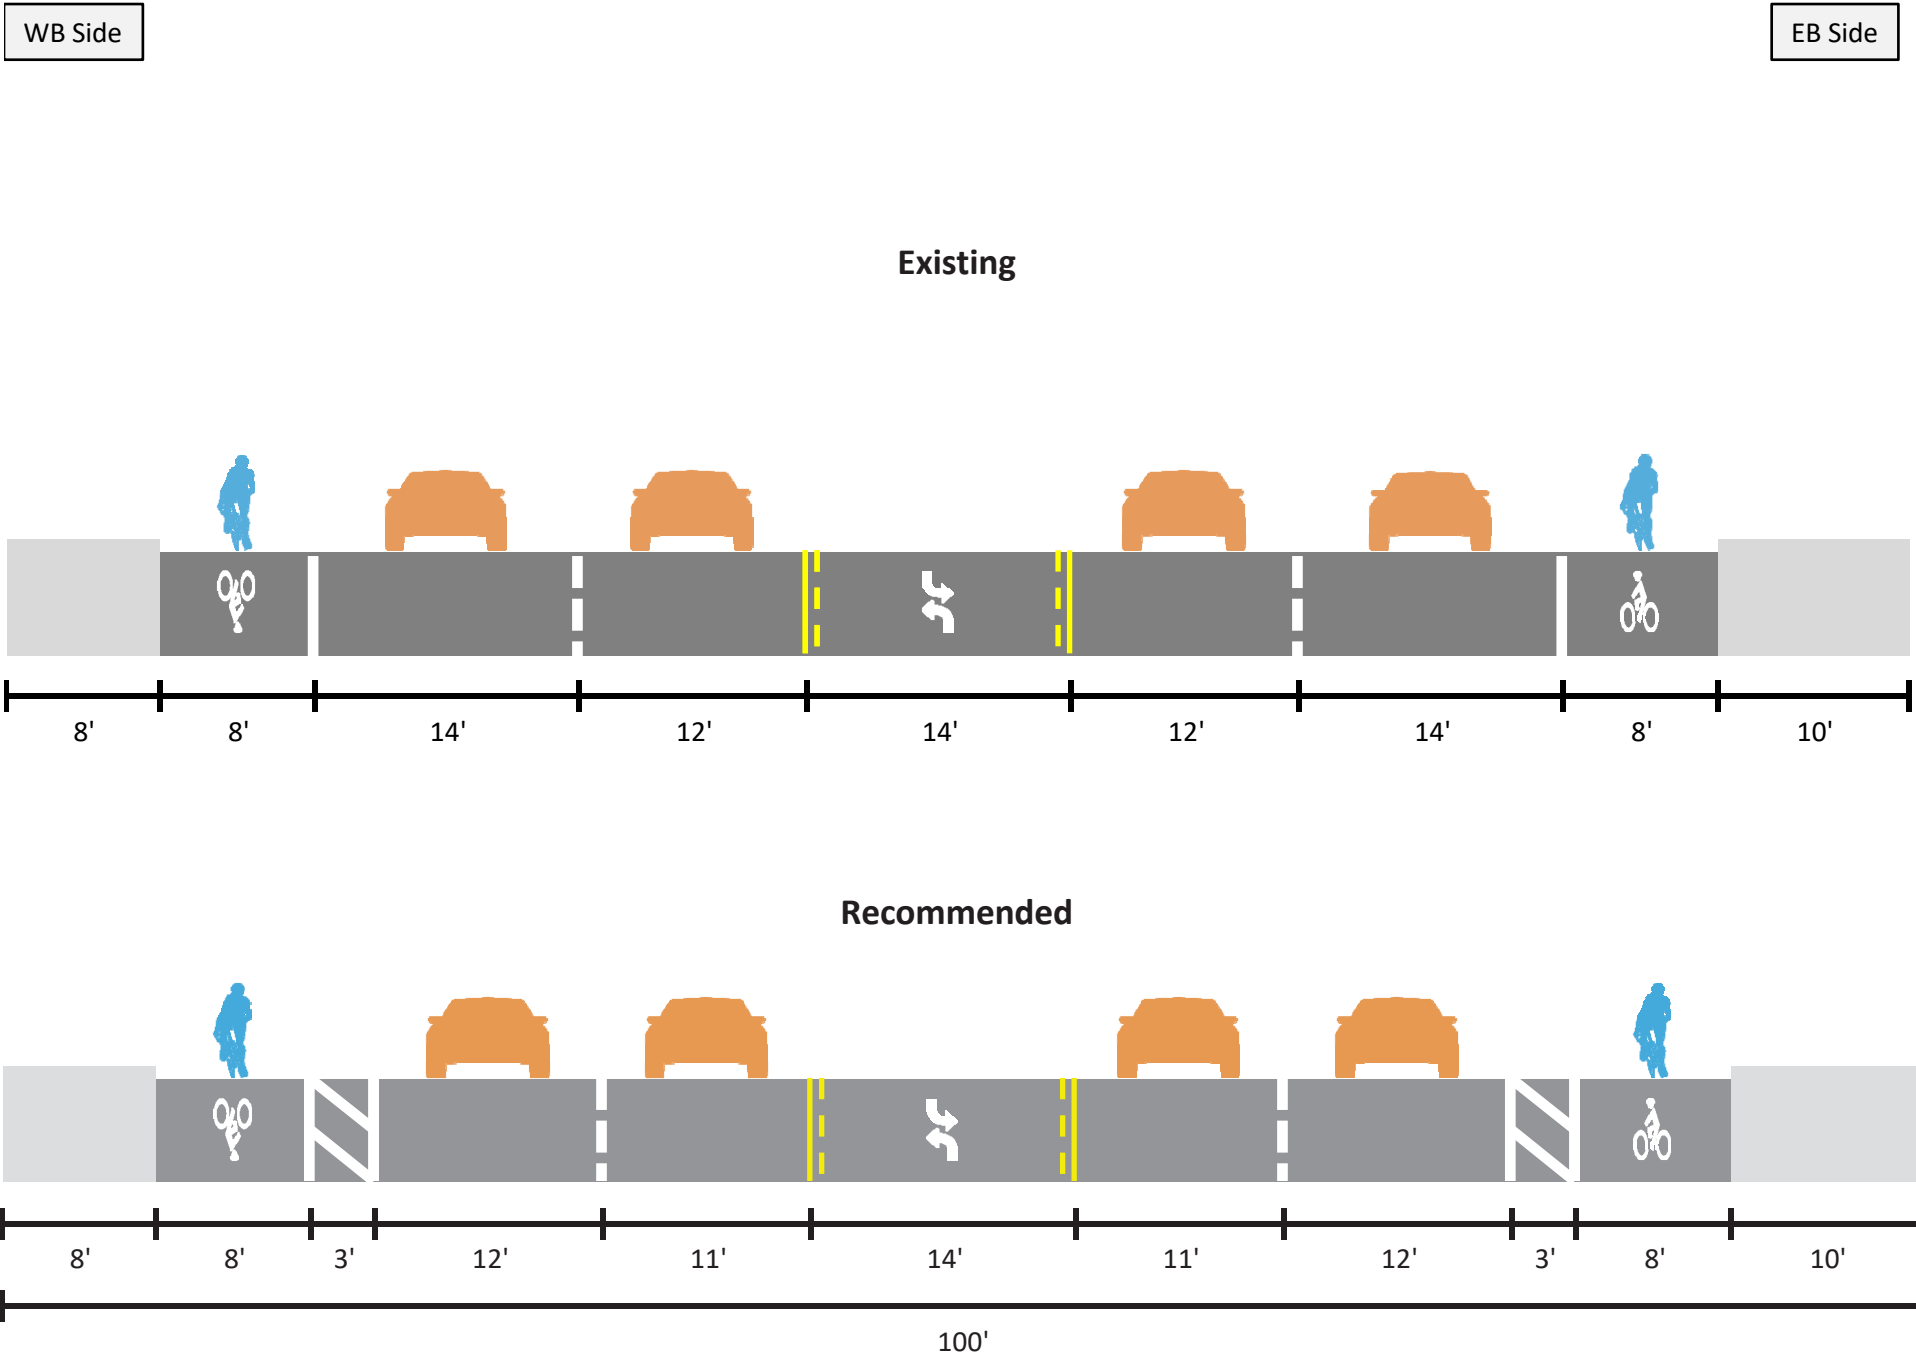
Recommended Roadway Cross-section for Villa Park Road Between Lemon Street and Hewes Street
